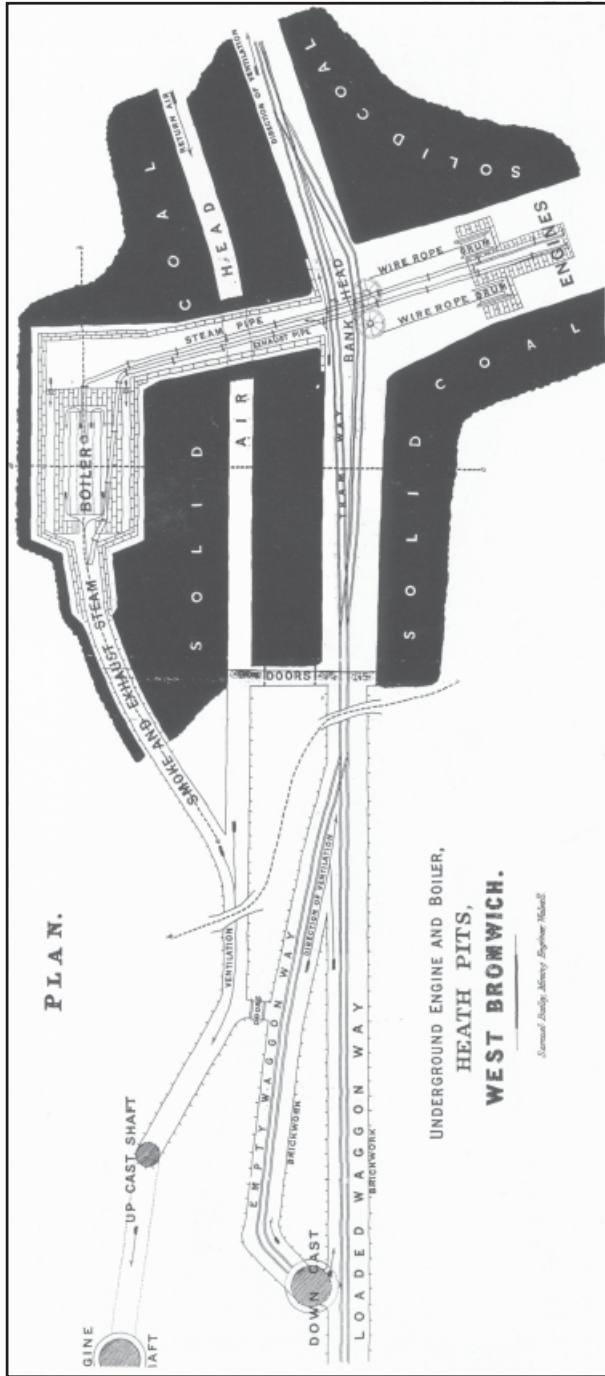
Plan of the underground steam hauling engine at the Heath Colliery.
